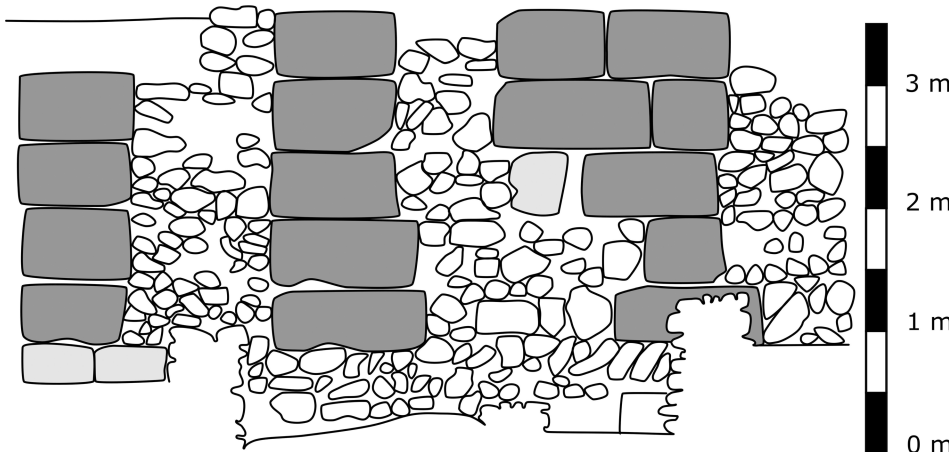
Niebla, area next to Puerta de Sevilla, Trench 8, elevation of Wall 5 (02-NI), (redrawn after Belén/Escacena 1993, fig. 2).
